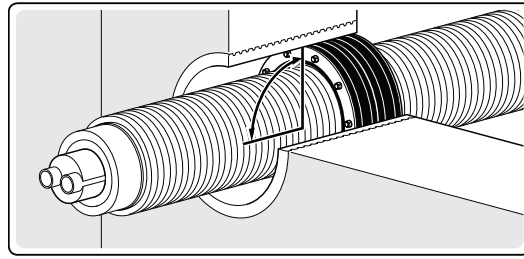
Install Wall Seal pipe at right angles to pipe
